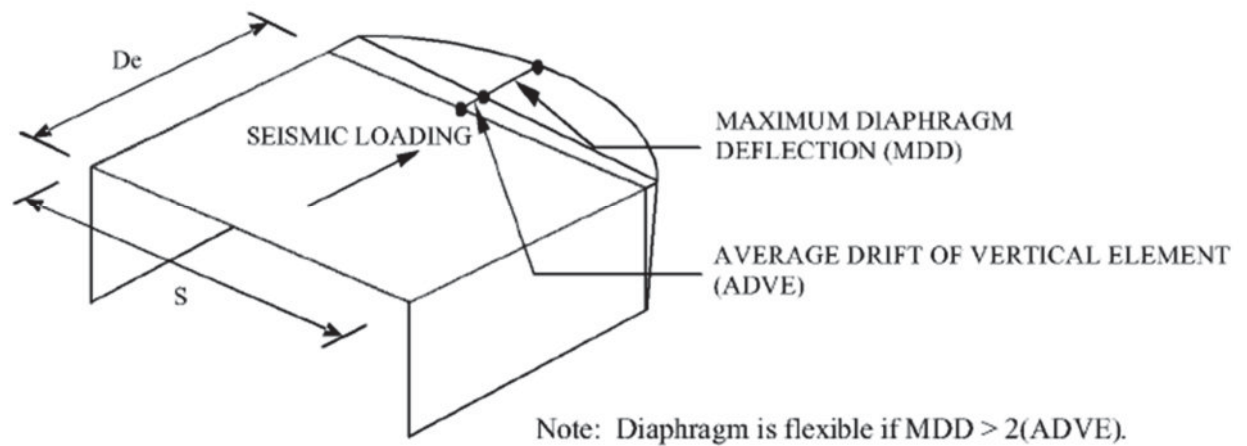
Floor Diaphragms (ASCE, 2010)
